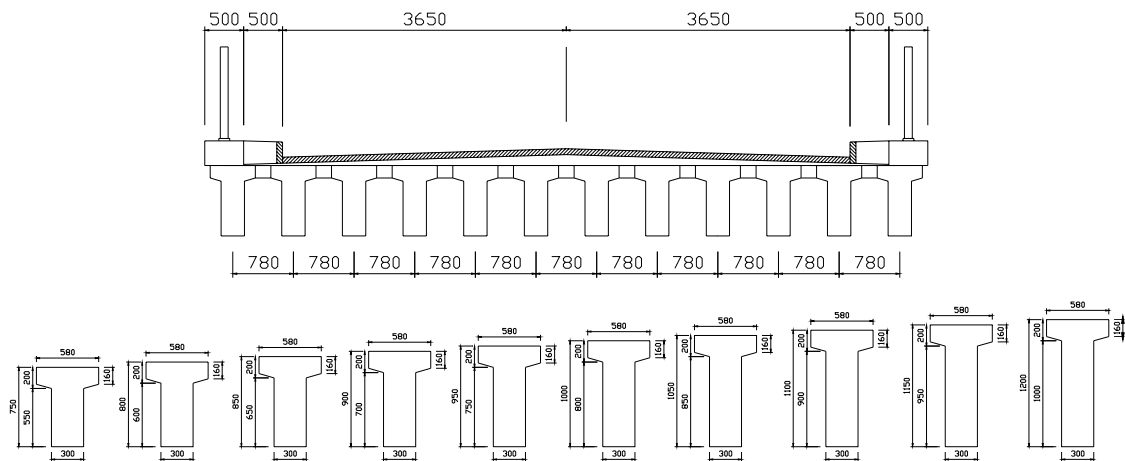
Typical two lanes girder bridge of T-shape
